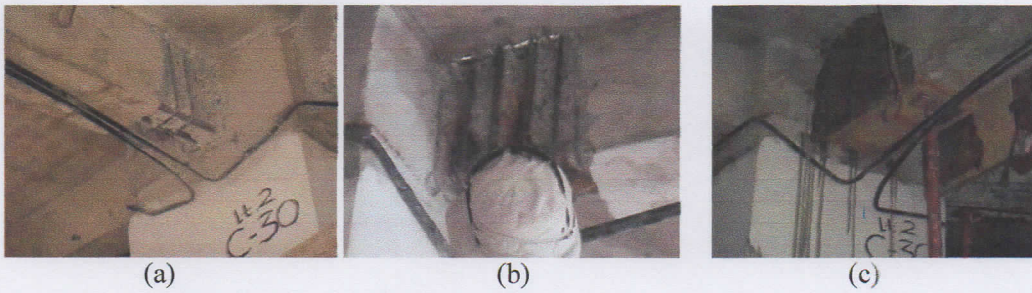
Retrofitting of damaged beam – damaged beam (a); additional confinement (b); re-concreting (c).
